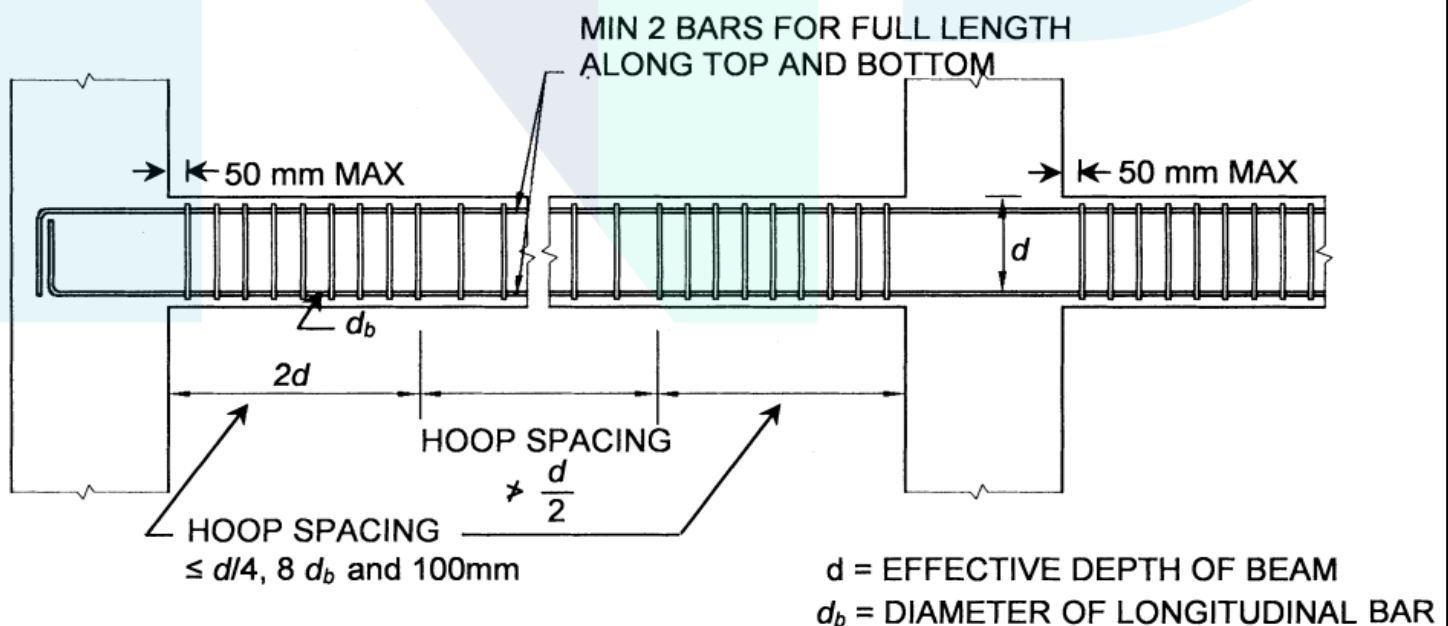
DETAILS OF TRANSVERSE REINFORCEMENT IN BEAMS
